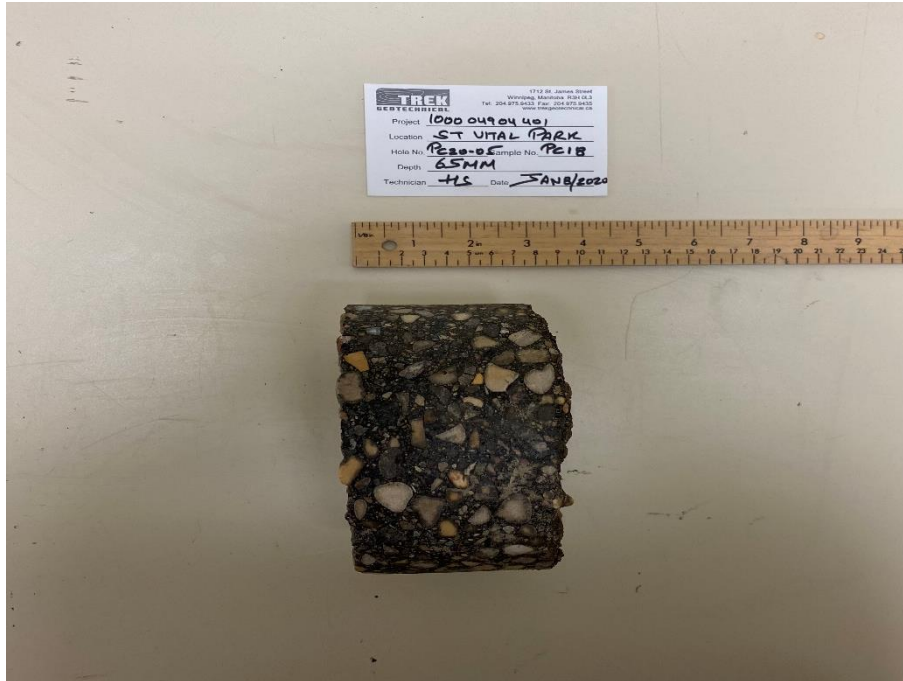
Pavement Core Sample at Pavement Hole PC20-05
